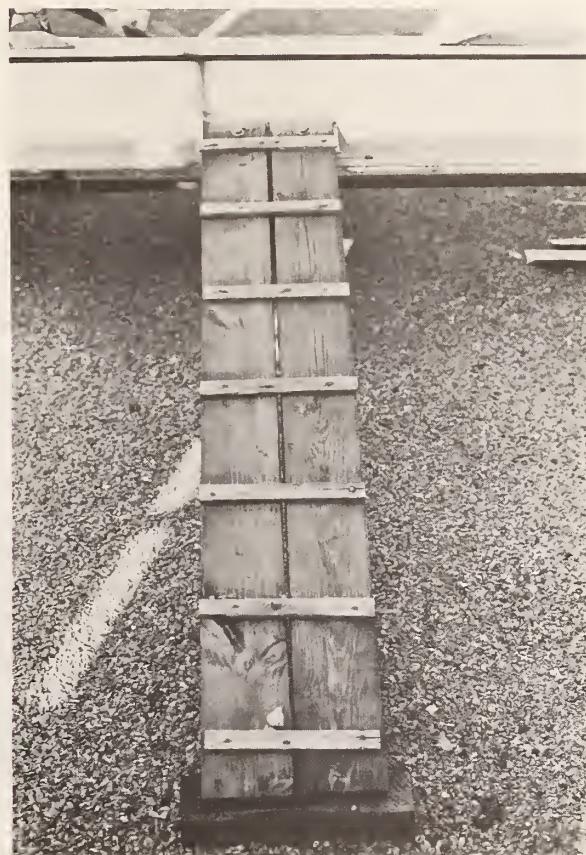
Narrow and Steep Ramp for Passage Over Steel Beam of Collector Frame
